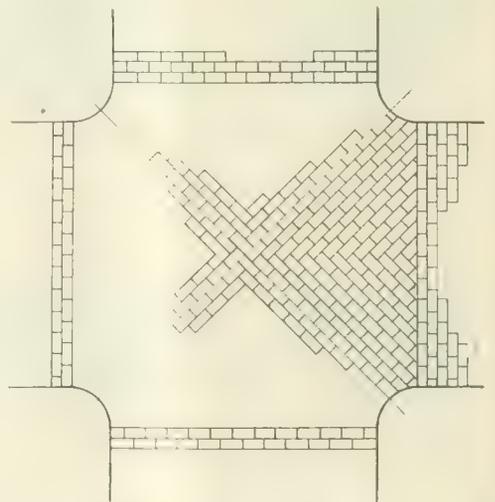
Double Diagonal Plan for Paving Street Intersections.
